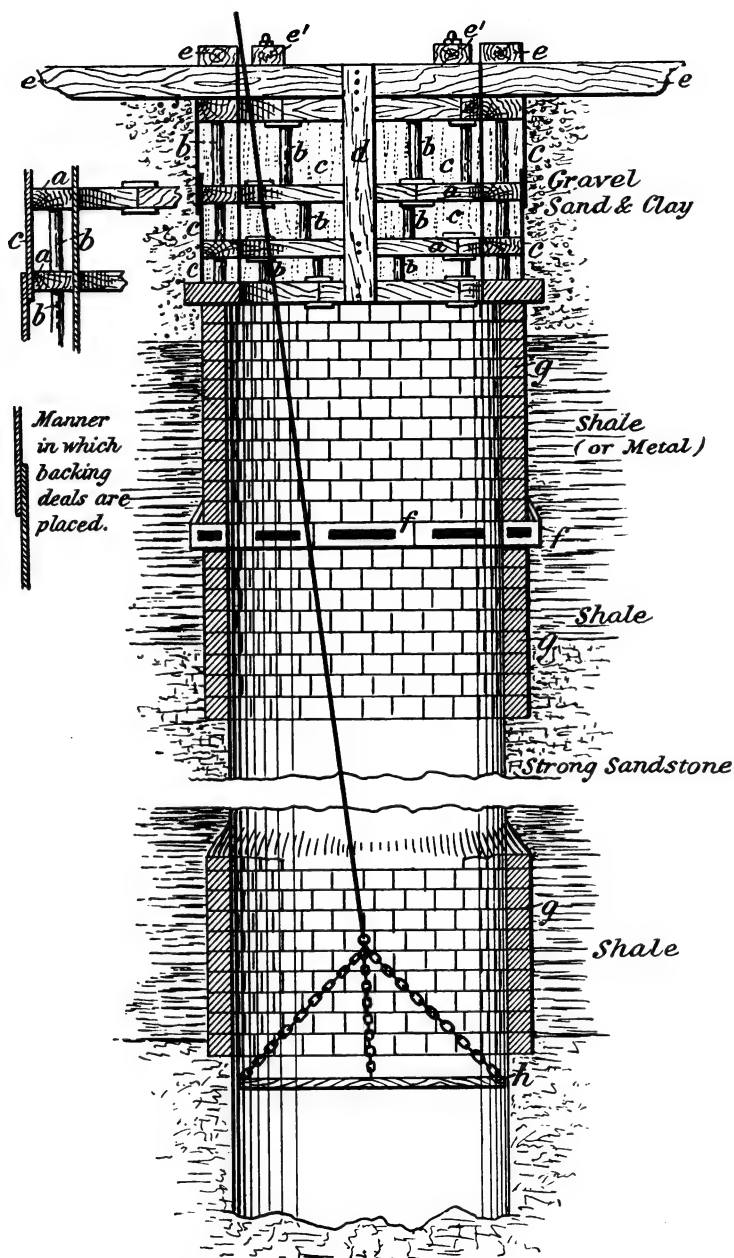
Section of a shallow Shaft of Small Diameter showing (a) Cribs; (b) Punch Props; (c) Backing Deals; (d) Stringing Deals; (e) Sills from which Stringing Deals are hung; (e') Sills for Trolley Rails; (f) Walling Curb; (g) Walling; (h) Walling Platform.
